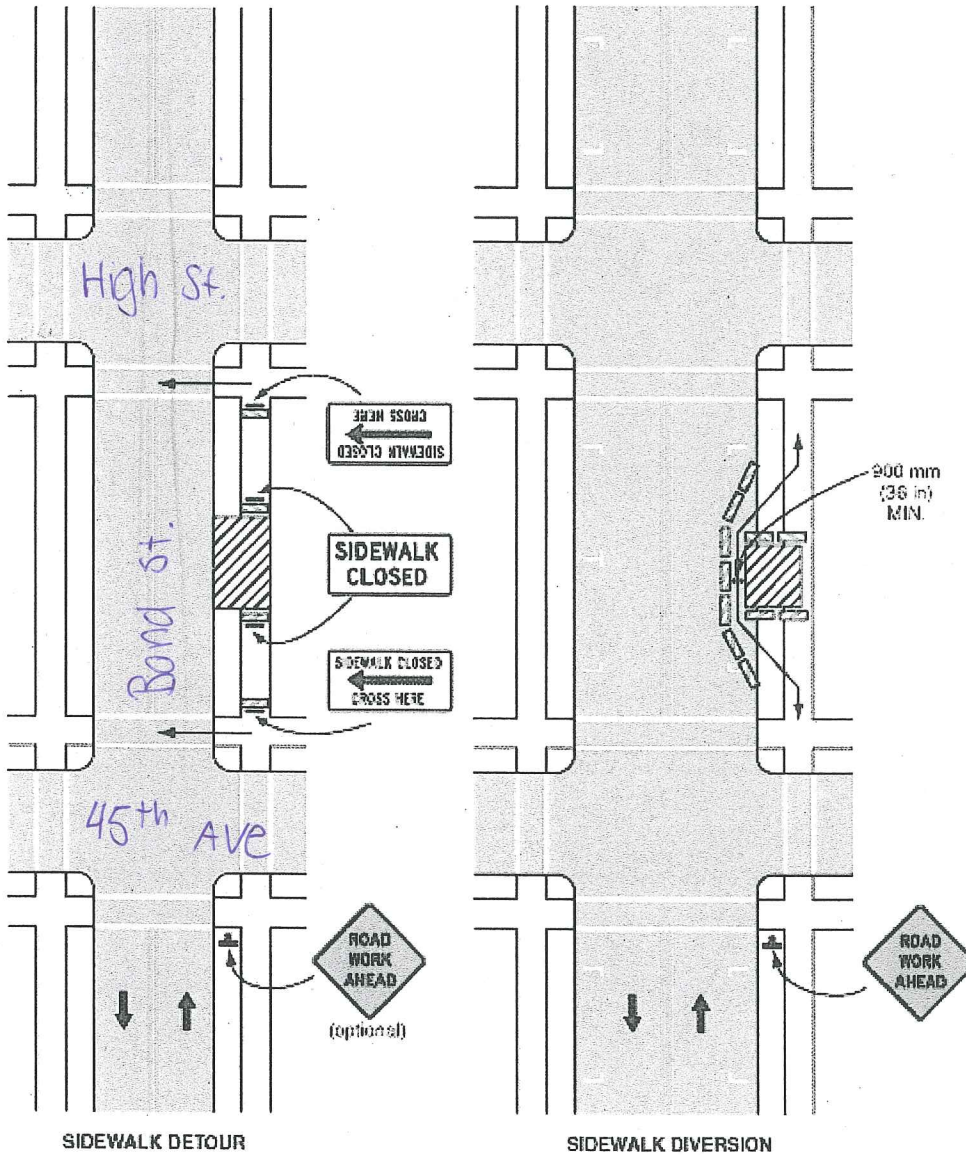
H-28. Sidewalk Detour or Diversion (TA-28)
